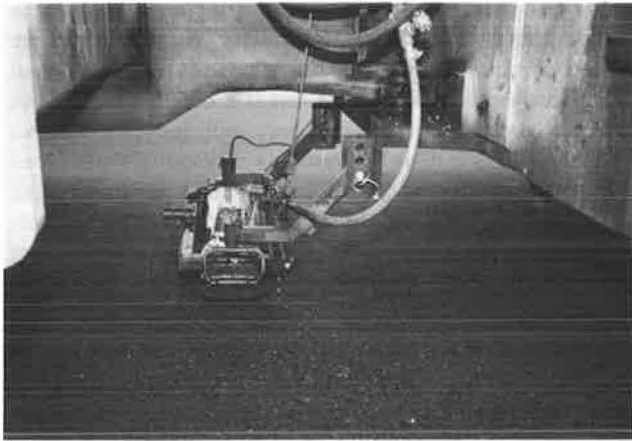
DOR installed on tandem steel wheel vibratory roller.
